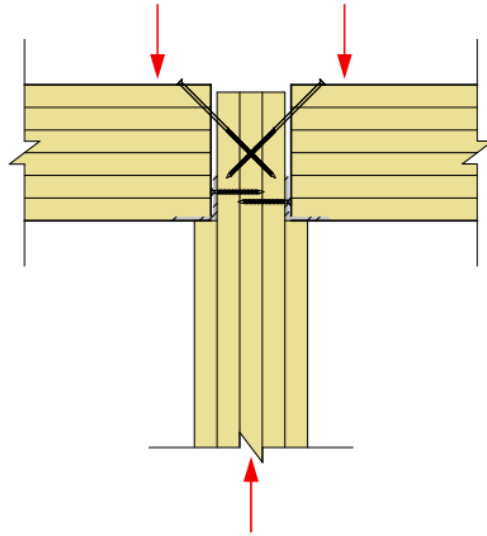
COLUMN AND BEAM SYSTEM (“GLULAM HANDBOOK VOLUME 1” 2013)
